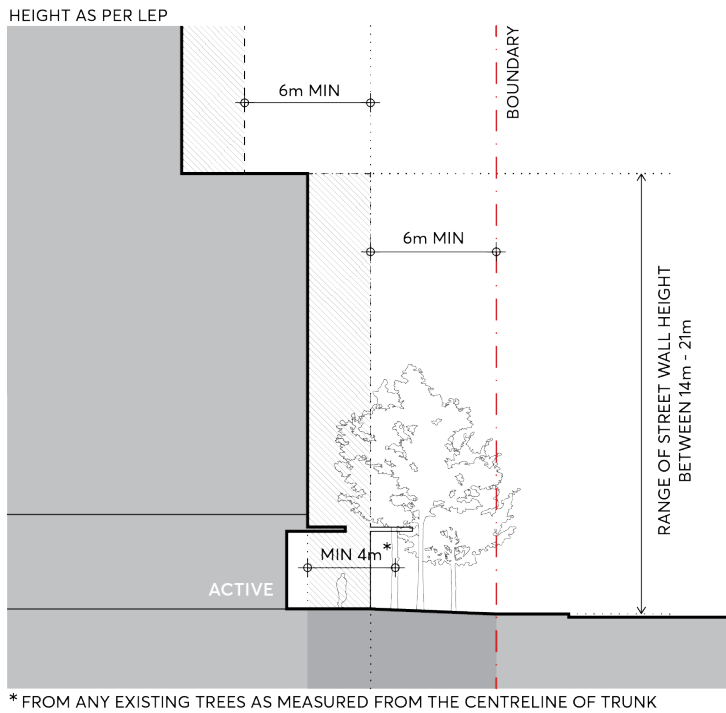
Campbell Street (Section B) Setbacks and Street Wall Height
